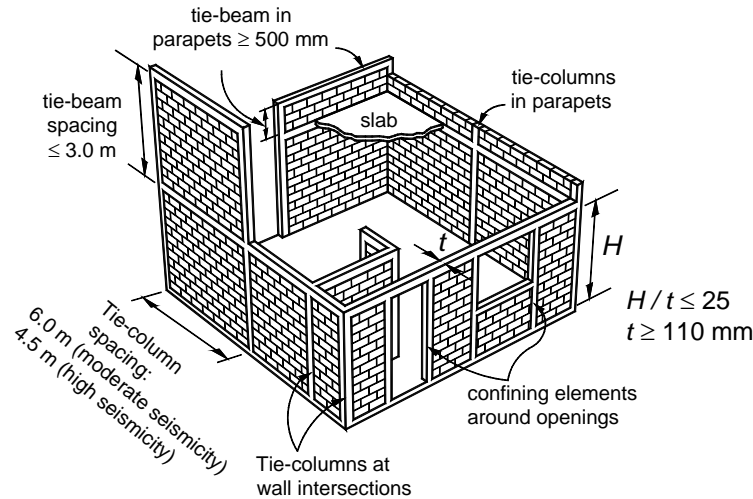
Key recommendations for non-engineered confined masonry buildings (EERI, 2011, adapted from NTC-M, 2004).
